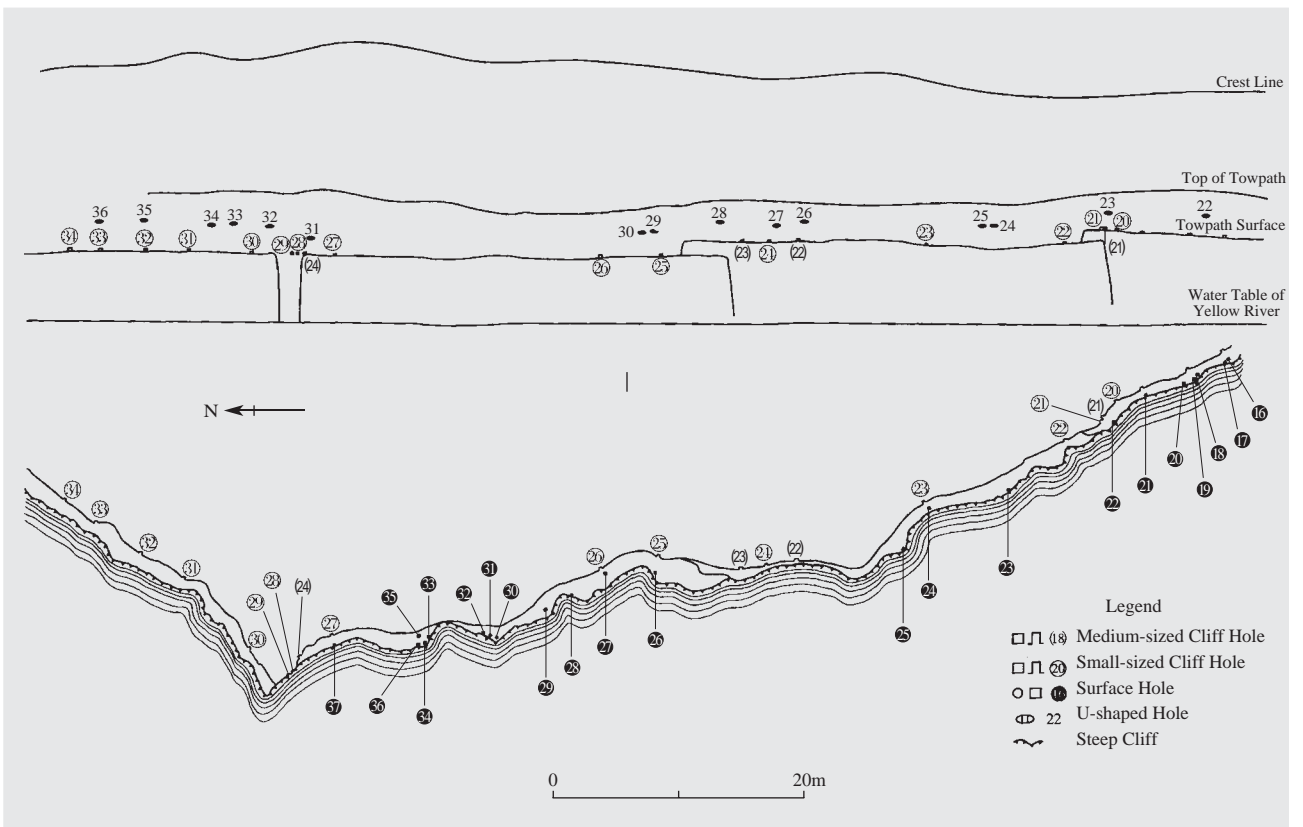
The Elevation and Plan of Towpath Remains of Section Five (2)
